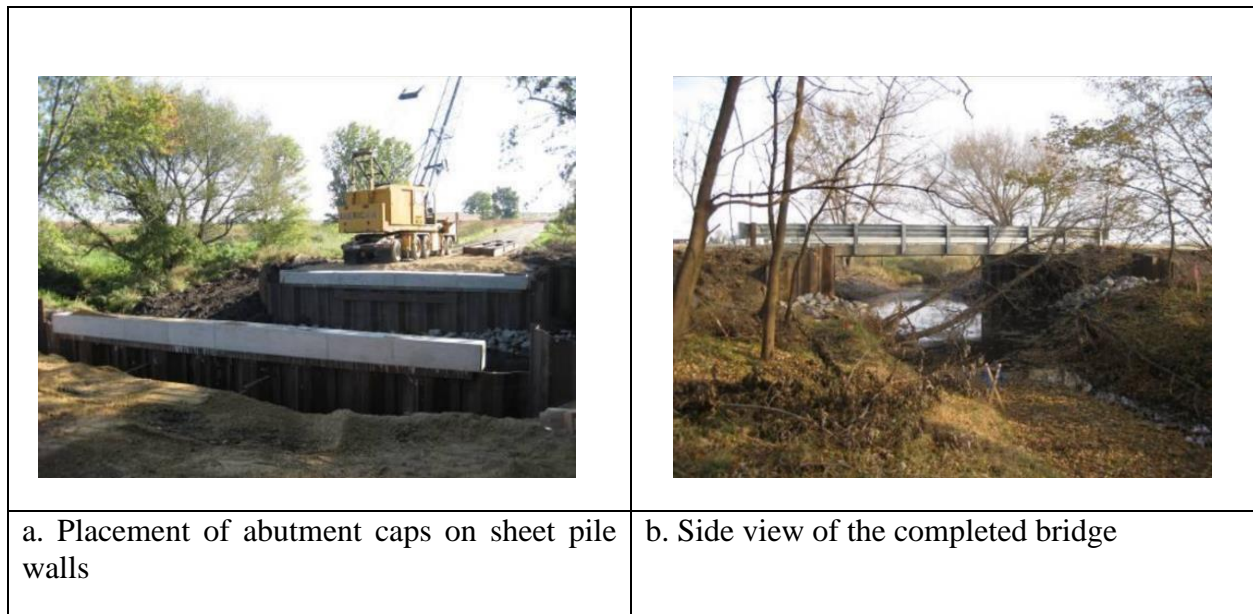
Black Hawk County bridge resting on sheet pile walls (Evans et al., 2012)
